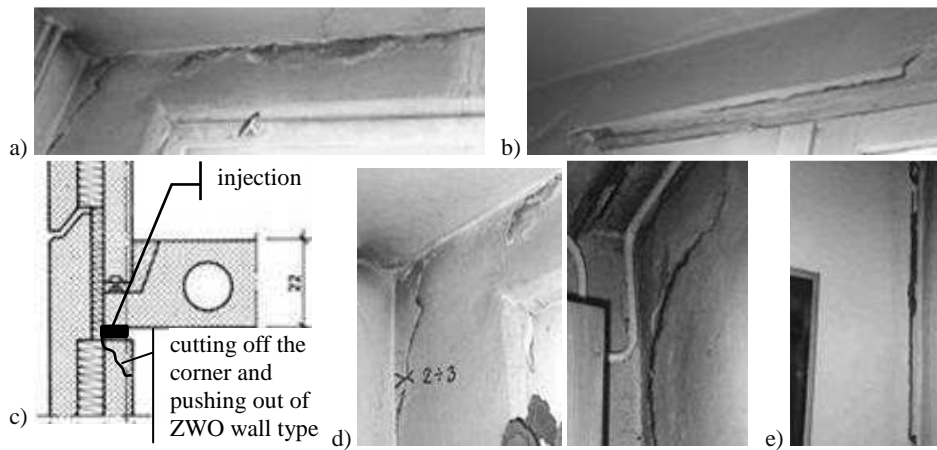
Examples of damage in horizontal ZWO-S-ZWO wall type joints due to an in-service defect (injection of the gap beneath the floor): a), b), c) cutting off the upper corner of the load-bearing layer of wall and pushing out of ZWO type wall, d) inclination of wall and associated cracking in joints, e) gap with thickness of 5-8 mm between the ZWO type wall and partition wall
